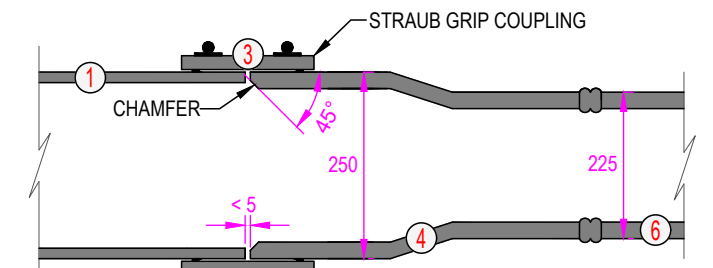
B: ADAPTING DN225 DWV PIPE to DN225PE PIPE
